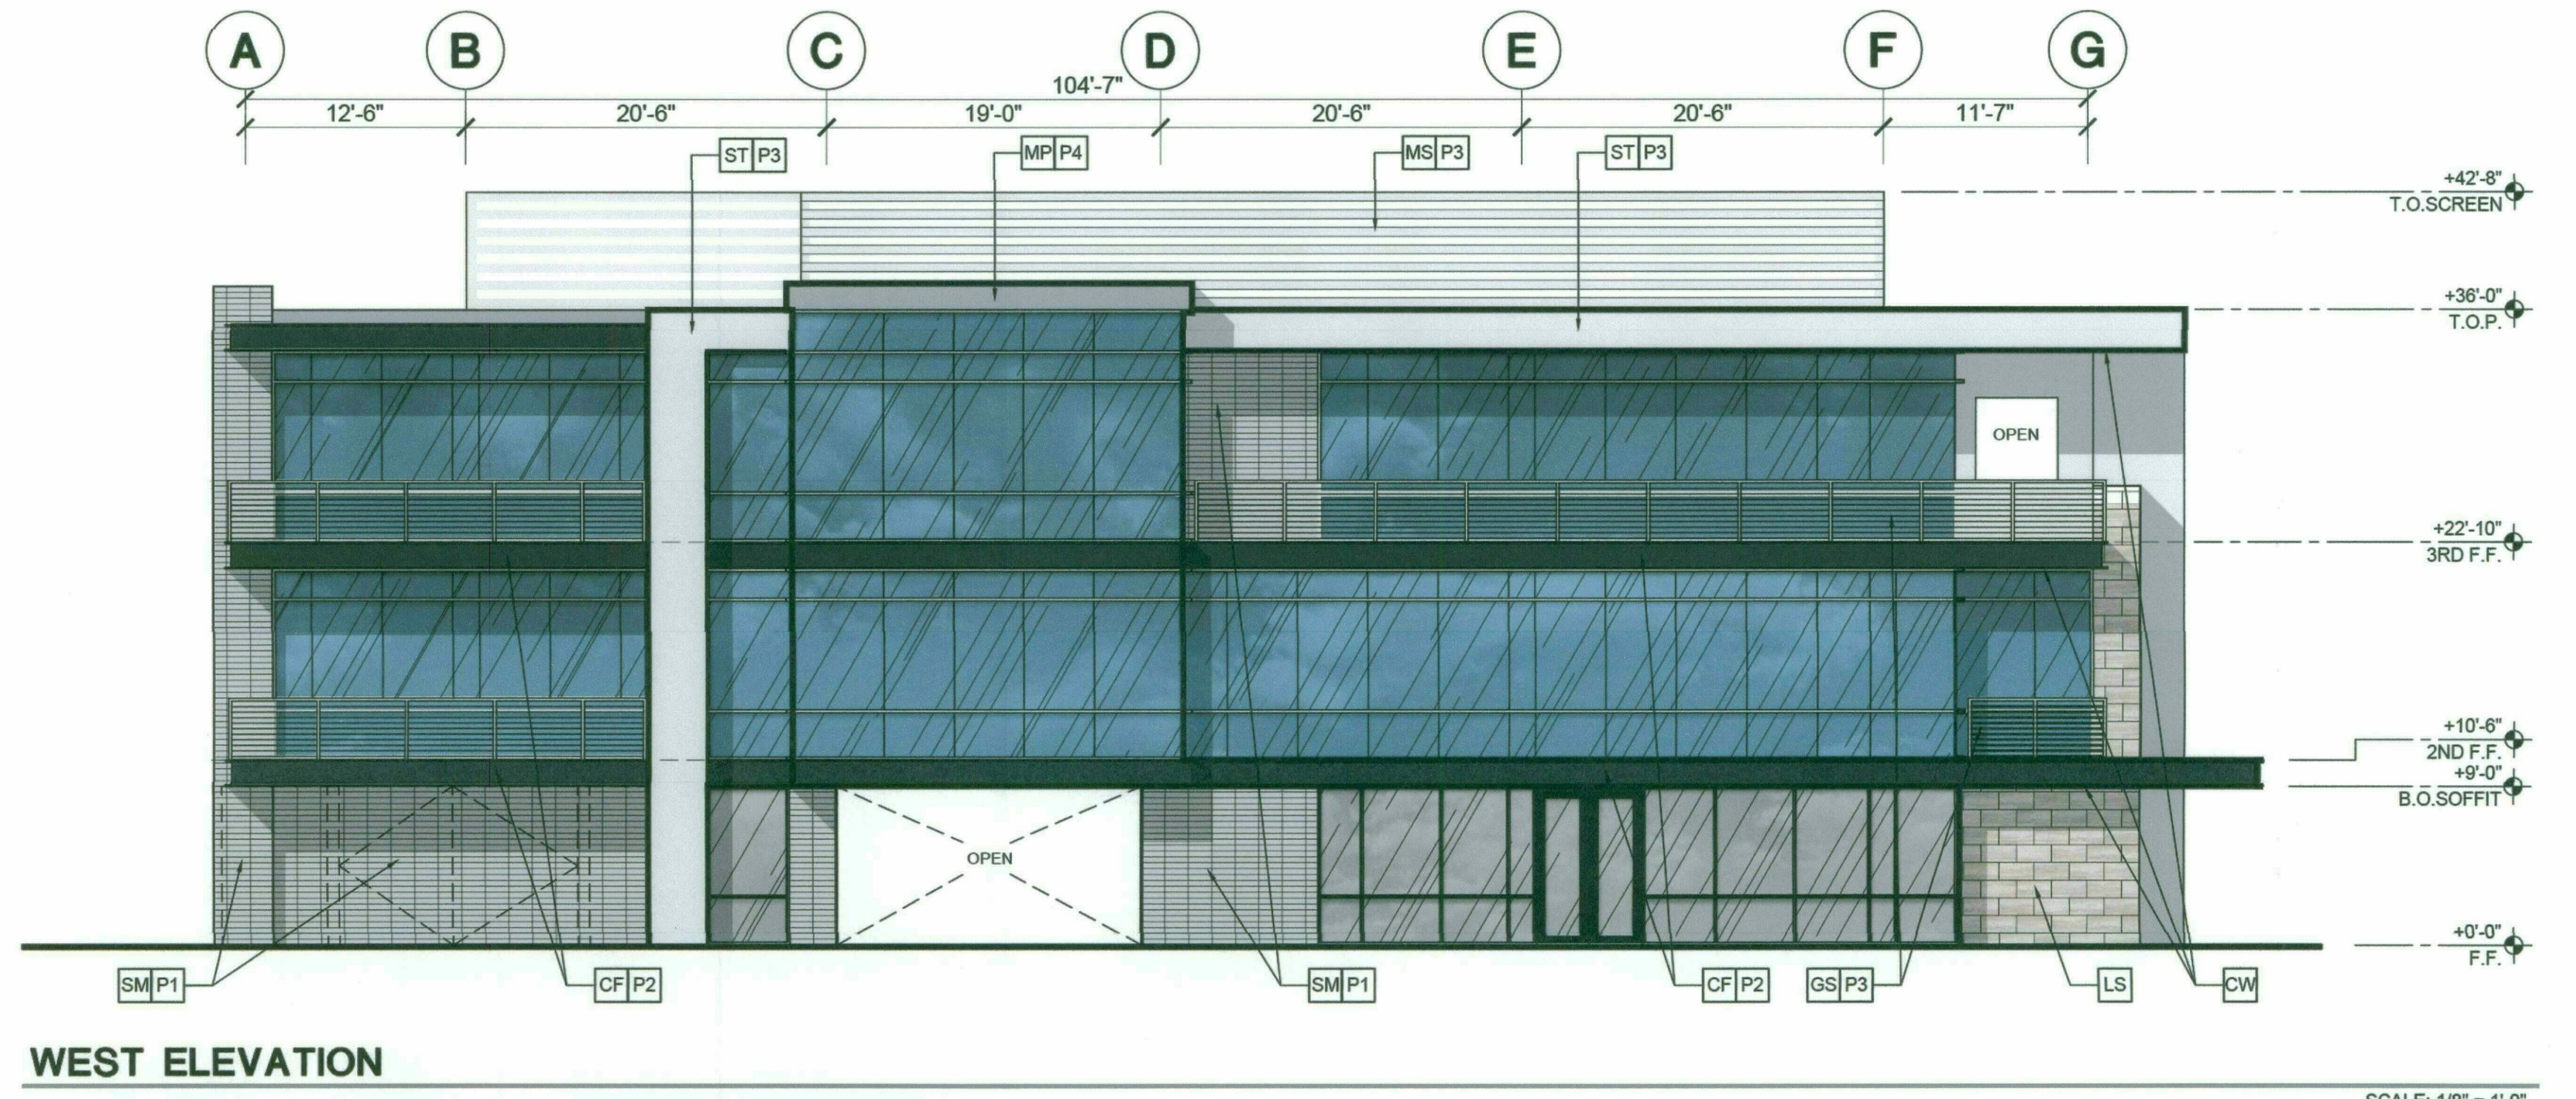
EXHIBIT OF TYPICAL EXTERIOR WINDOW WALL W/ DEEP HORIZ. MULLIONS GLAZING & FRAME RECESS AT EXTERIOR WALLS
